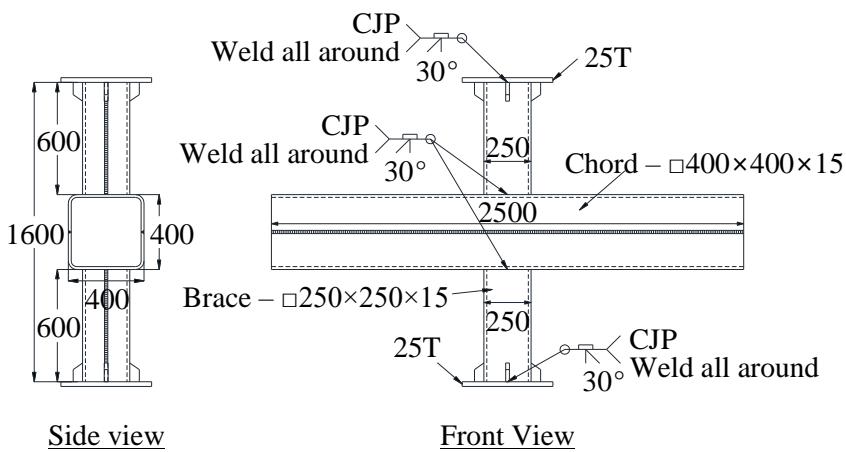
Drawing of the geometry of specimen #1 and specimen #2
